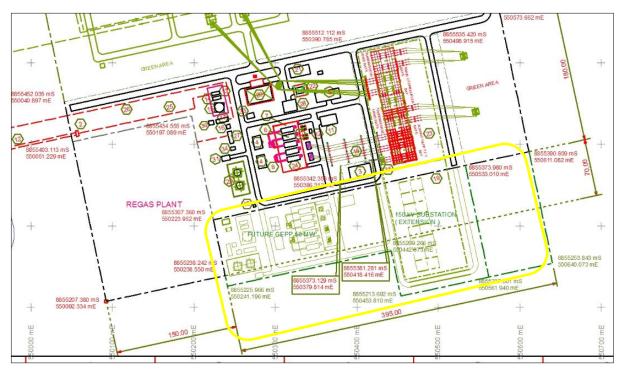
Layout plan of the planned project site Kupang 2 (marked in yellow), bordering the planned Kupang 1 Peaker site in the North.
